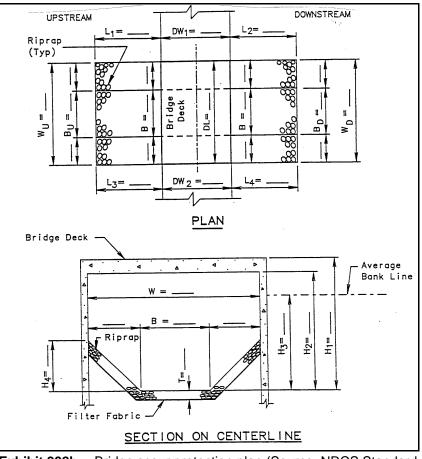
Bridge scour protection plan (Source: NRCS Standard Specifications)
